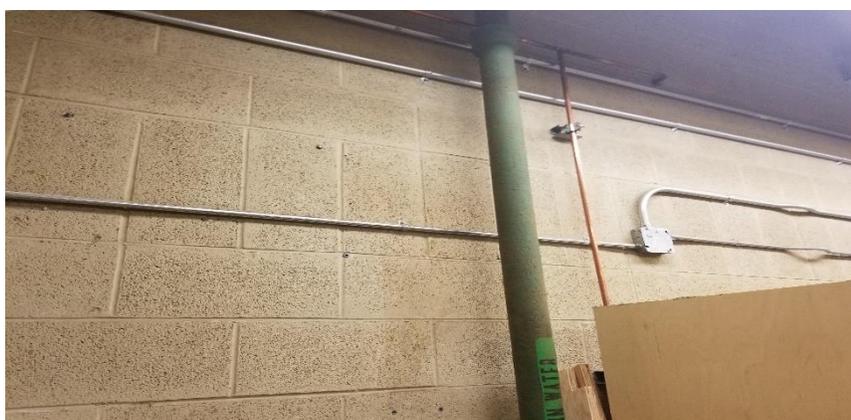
View of asbestos-containing parging cement on pipe fittings observed to be in good condition in Room B408A.
